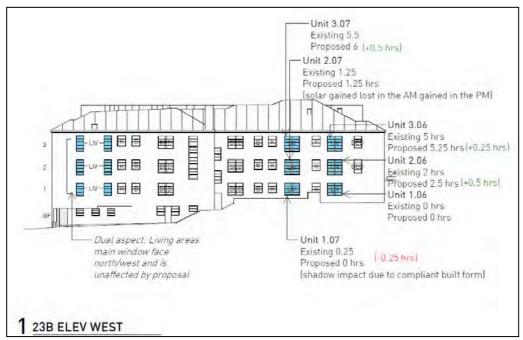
Impact on direct sunlight received by north-facing apartments, 23 Billyard Avenue (Source: Architectural Plans, Smart Design Studio)
